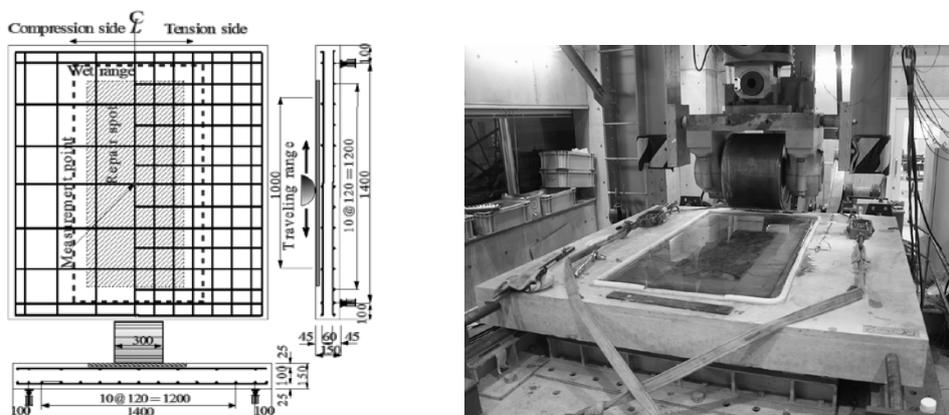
Dimensions of test specimen, plumbing diagram and appearance of running load fatigue testing machine.
